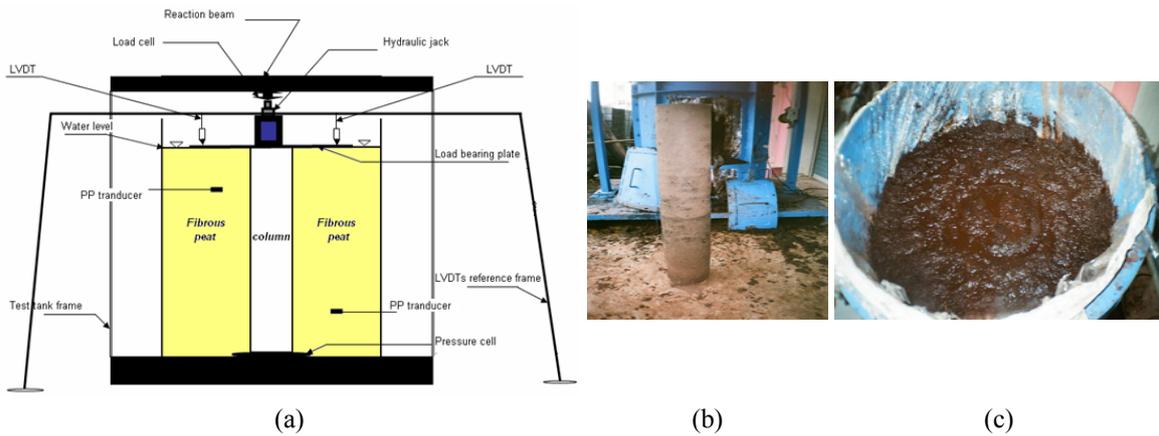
Plate load test: (a) Schematic cross sectional loading diagram of peat and precast column in the test tank; (b) A precast peat column; (c) Precast peat column after being installed, and soaked in the test tank prior to be tested for plate load test
